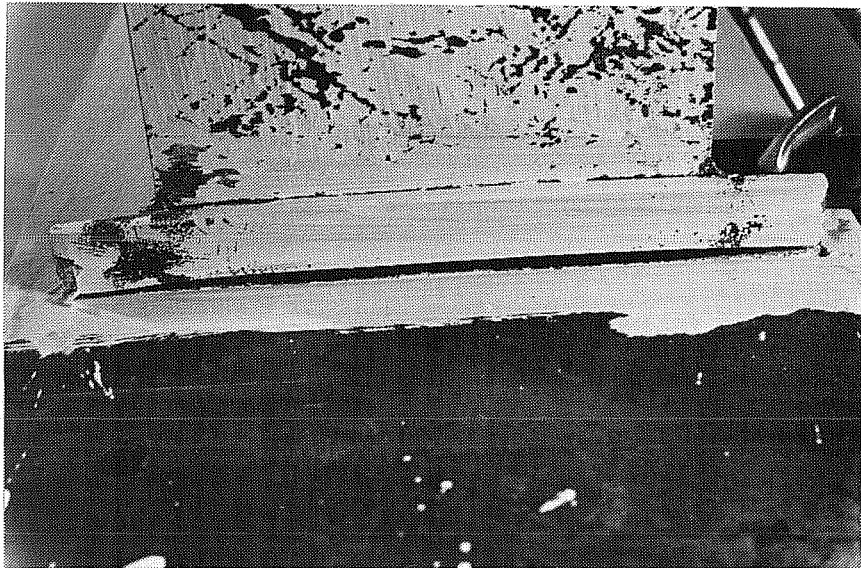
Bottom Flange Failure in Specimen 4
